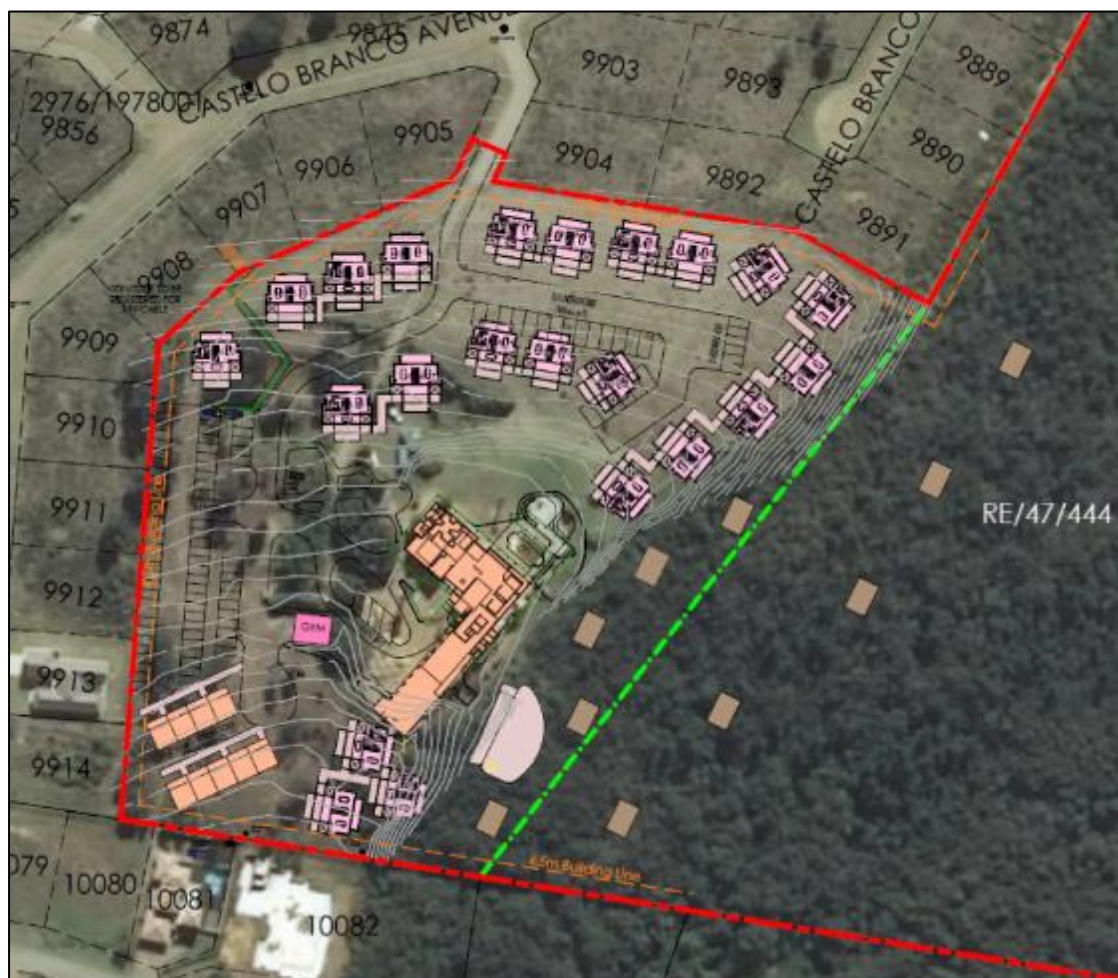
PROPOSED DEVELOPMENT - EXTRACT OF THE SITE DEVELOPMENT PLAN
